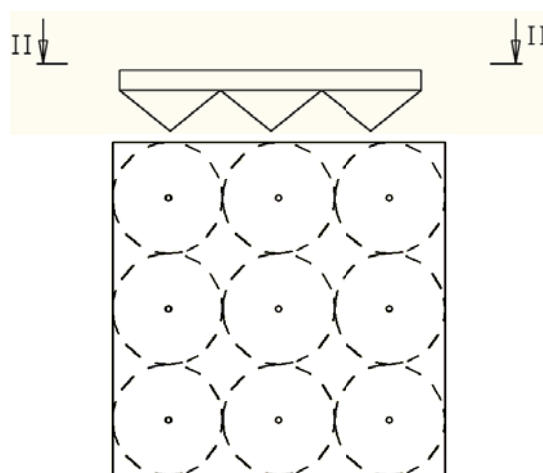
Reinforced concrete plate with a bottom surface of the pointed cone-shaped elements
